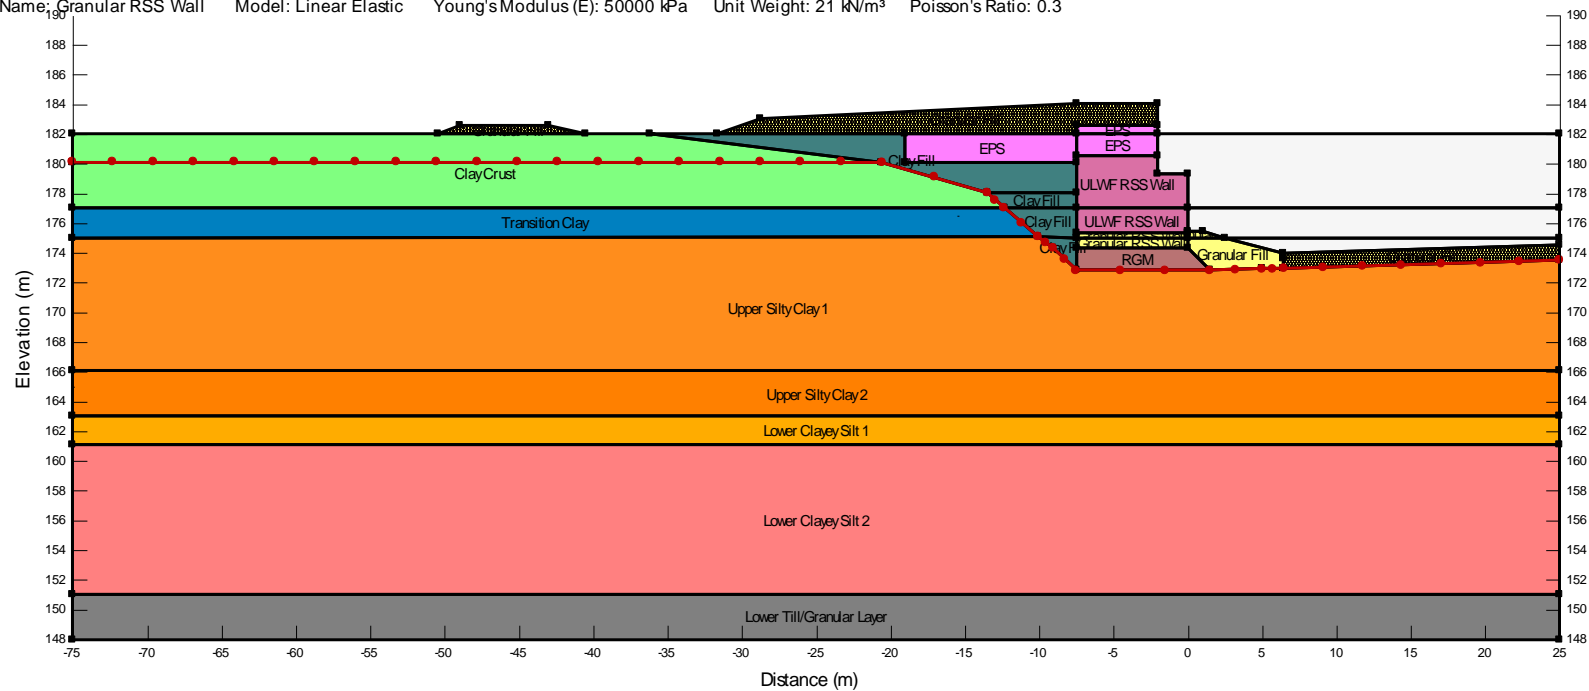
Slope Stability – Long Term – South Abutment – Return Wall – Station 10+450L Hwy 401
